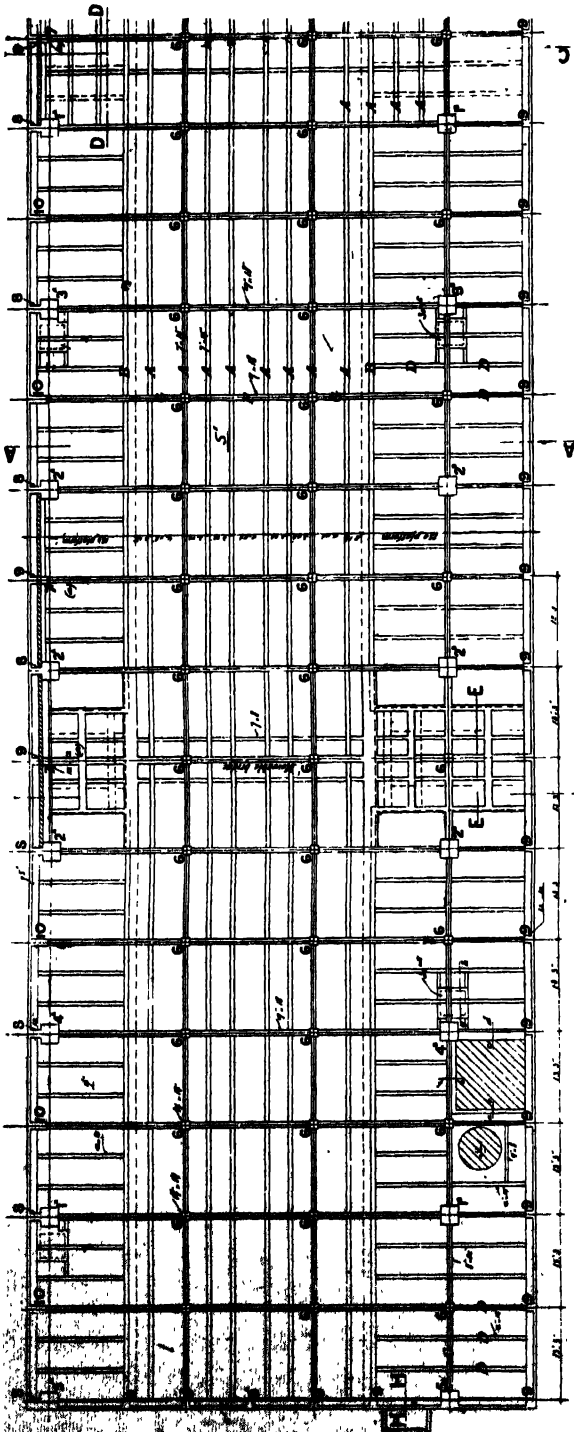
Plan showing Beams and Columns under Ground Floor.
